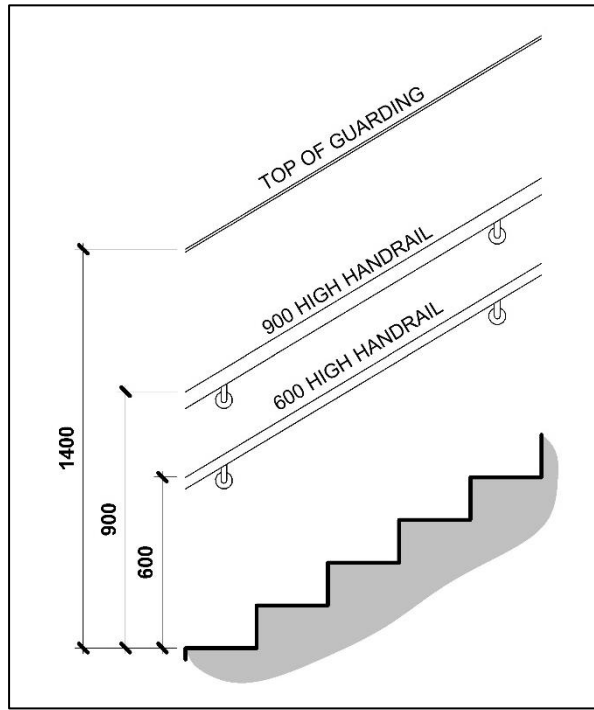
Heights of guarding and handrails above stairs pitch line.
